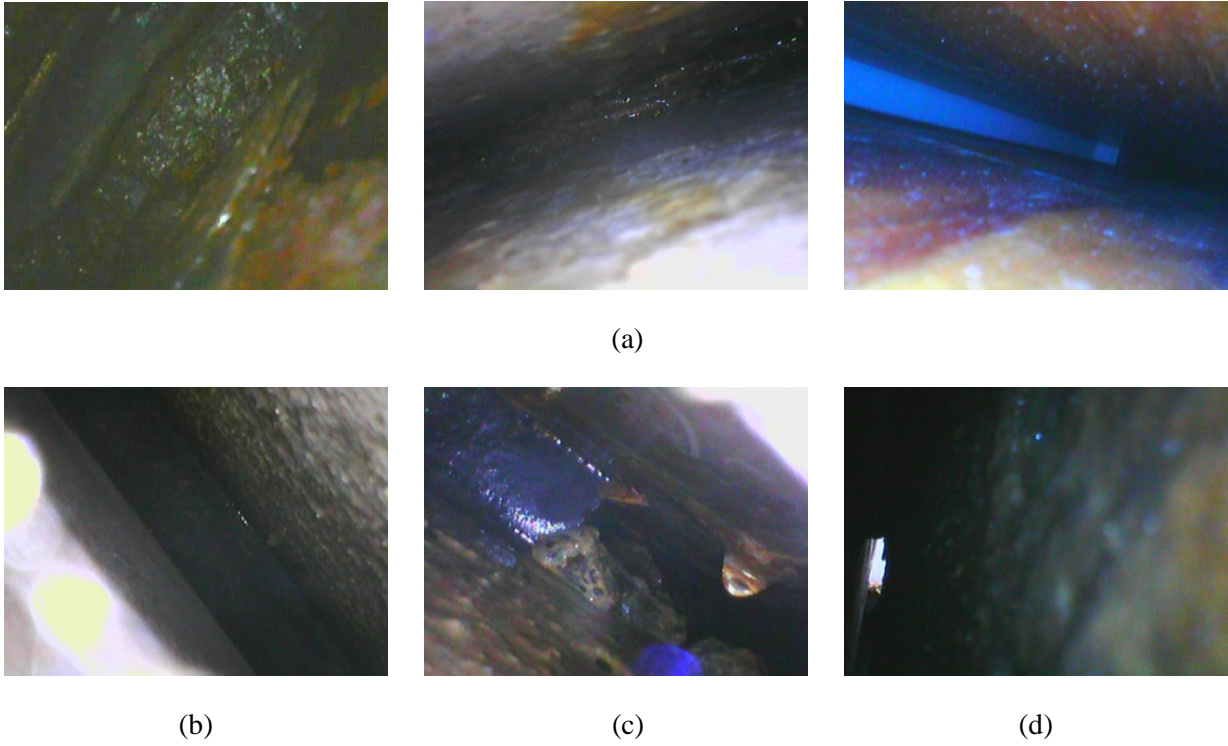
Boroscope views into the expansion joint (a), and examples of intact (b) and damaged (c) and (d) sections of the expansion joint at RI-steel_2
